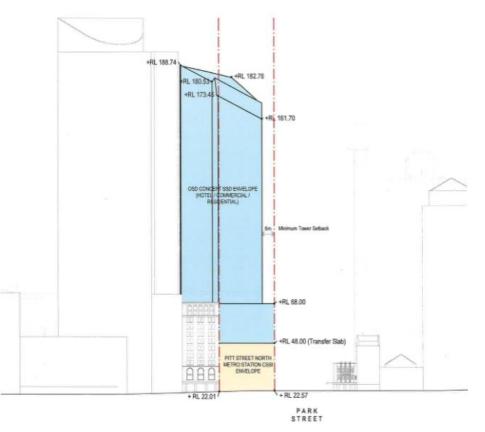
Pitt Street North Concept SSD DA – Envelope – West Elevation
